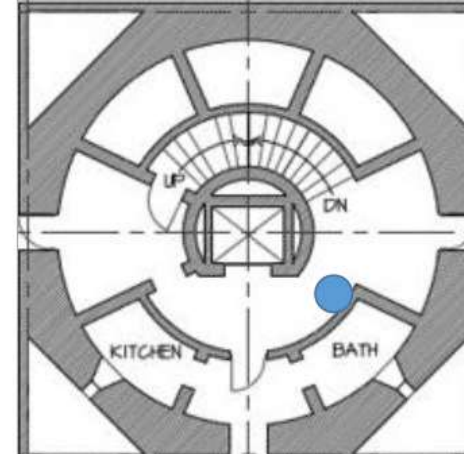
Blue dot shows efflorescence observed at the bottom of the stairs on the Outdoor Life mural.
